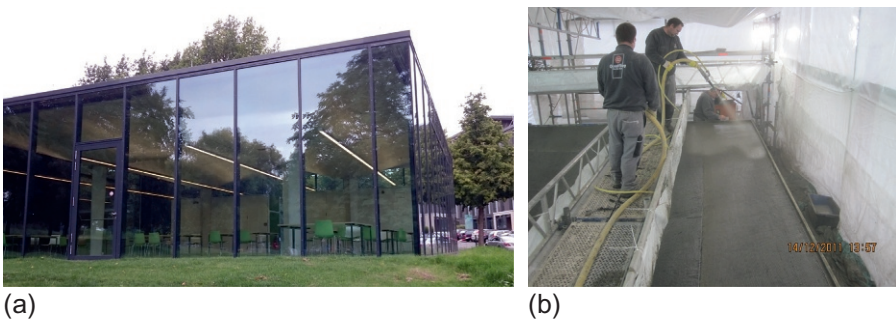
Façade of the INNOTEX building, RWTH Aachen University. (a) Overview (Rempel et al., 2015) and (b) cross-section (Horstmann et al., 2009).
